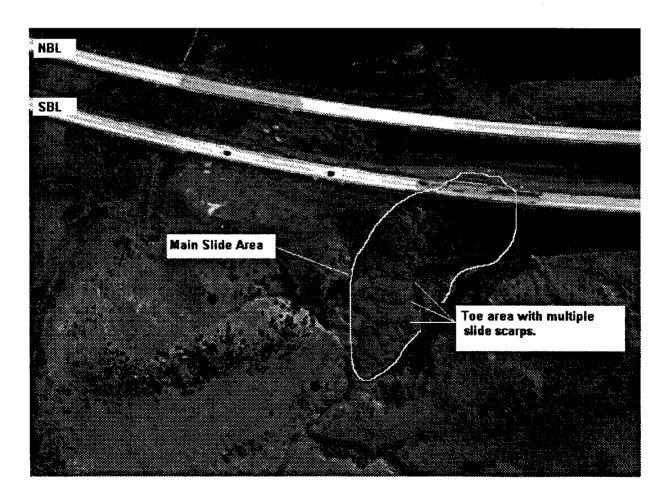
Air photo of M.P. 28.9 slide before reconstruction.
